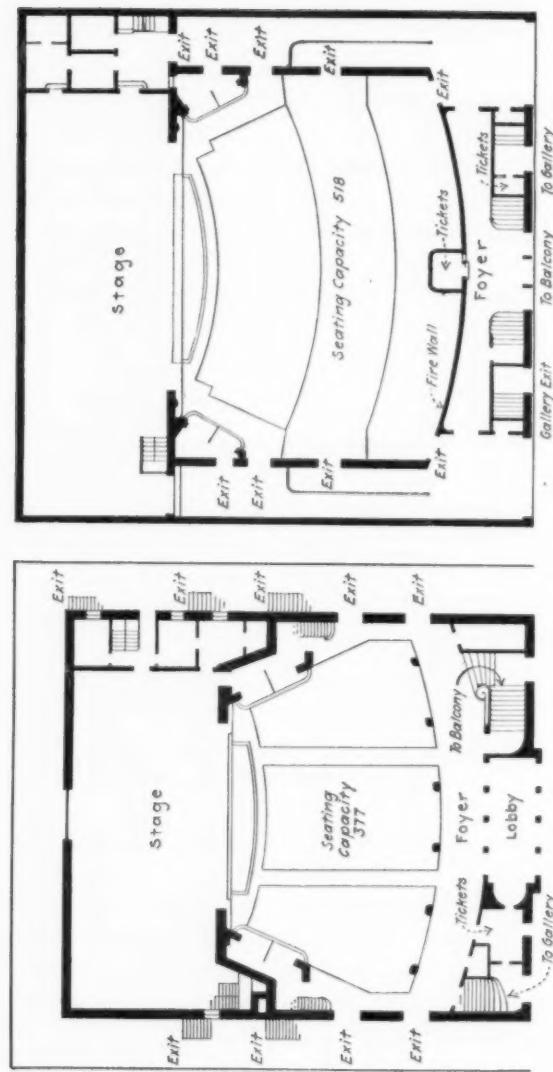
TYPICAL AND PROPOSED THEATER PLAN SHOWING USE OF FIRE WALLS, SIDE ENTRANCES AND EXITS
